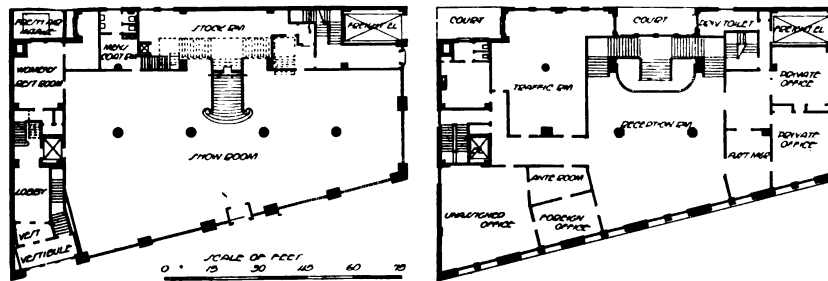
Floor Plans, Sales Building for Ford Motor Company, New York
